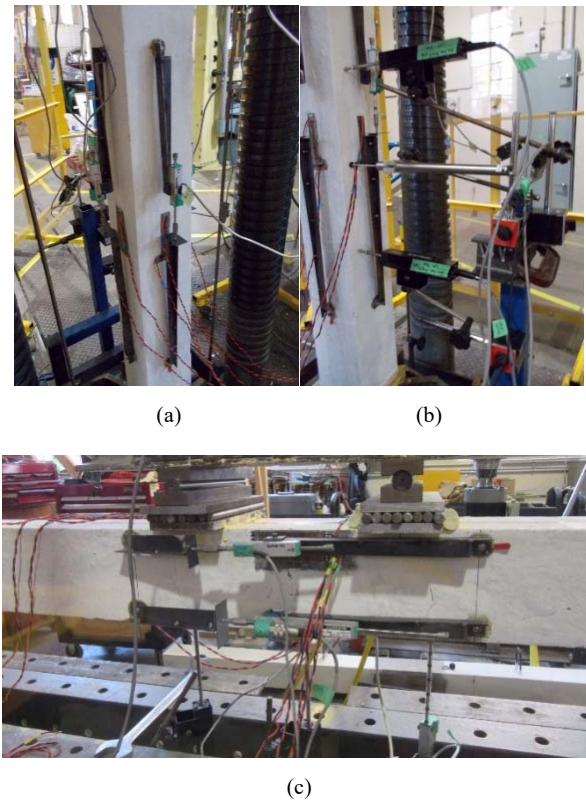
LVDT setup for UHPFRC members (a) longitudinal LVDTs measuring axial deformations of slender columns (b) horizontal LVDTs measuring lateral deformations of slender columns (c) longitudinal and vertical LVDTs measuring rotations and vertical deformations of UHPFRC beam
